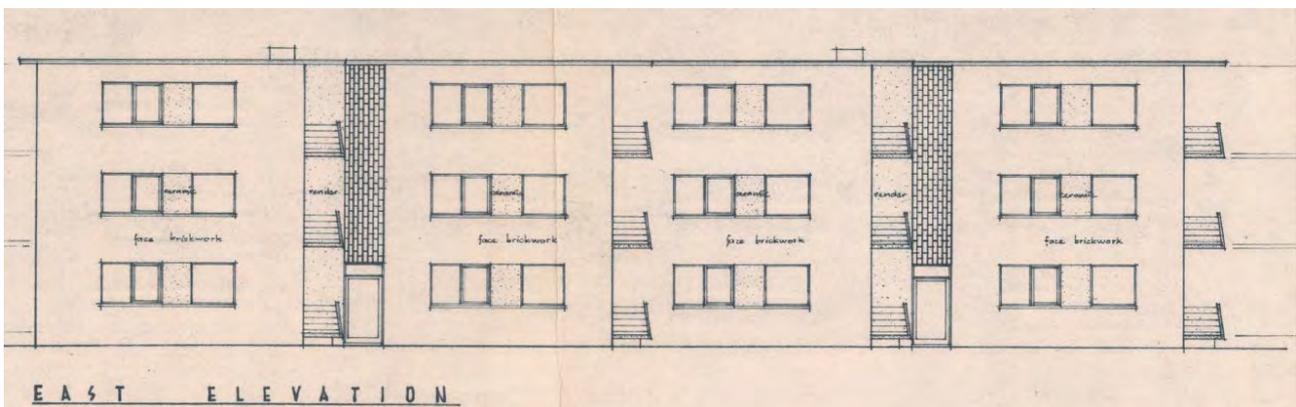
East elevation, Shirley Grove (Source: Council Building File)
